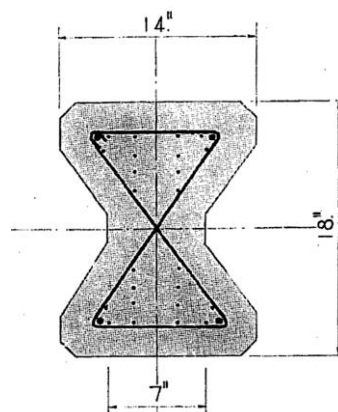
Section of prestressed precast concrete pile adopted for the foundations for the ocean terminal in Durban (Zakrzewski 1962)
